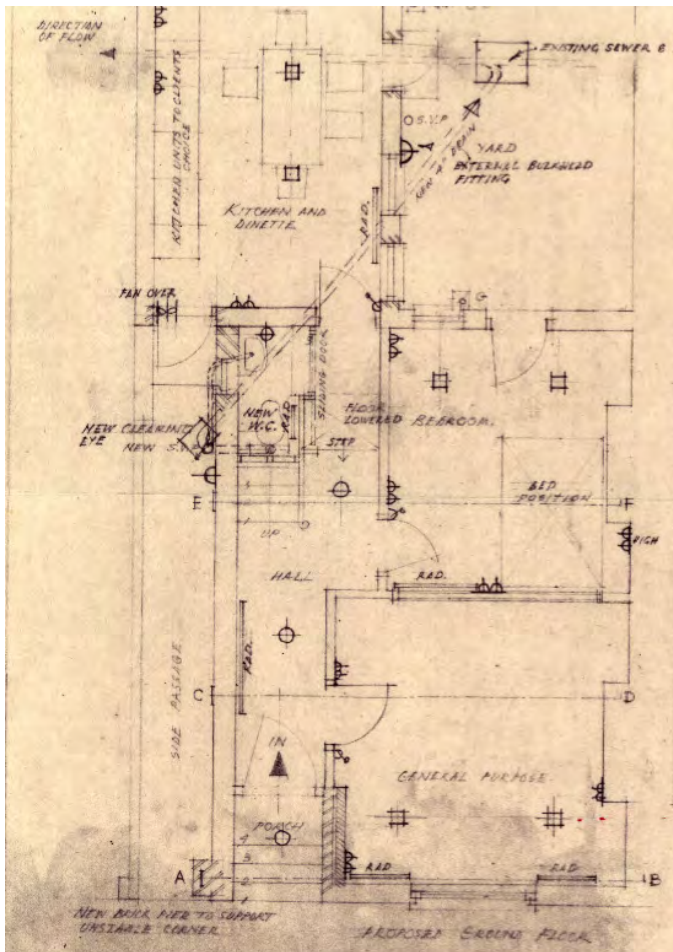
Proposed Ground Floor- From 1980 Planning Application
